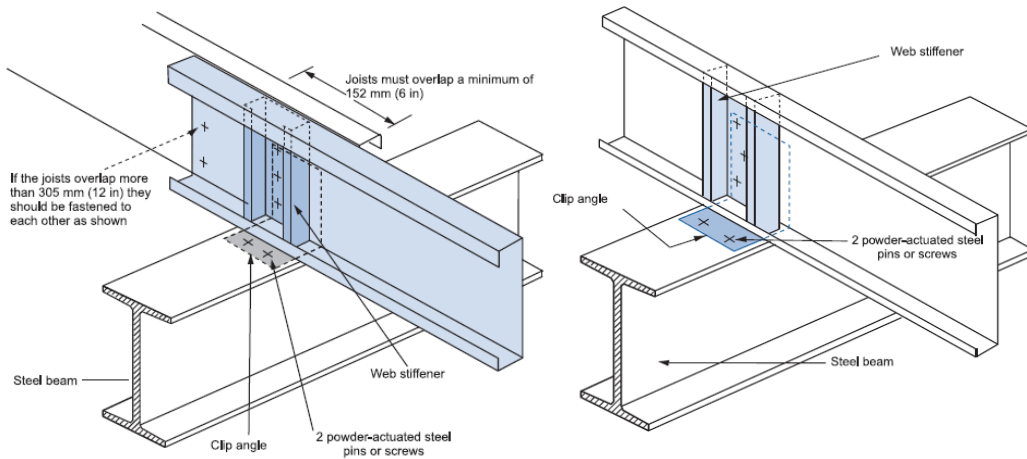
Lapped and Continuous Joists Supported on a Steel Beam [40]
